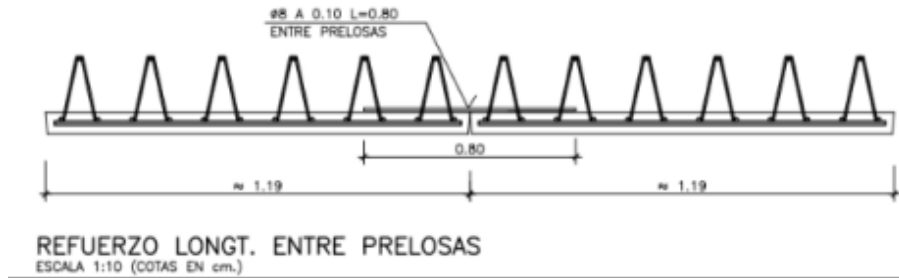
Additional longitudinal reinforcement laid across transverse panel joints. Translation: “Longitudinal Reinforcement Between Panels” (courtesy of Bridges and Roads, LLC.)
